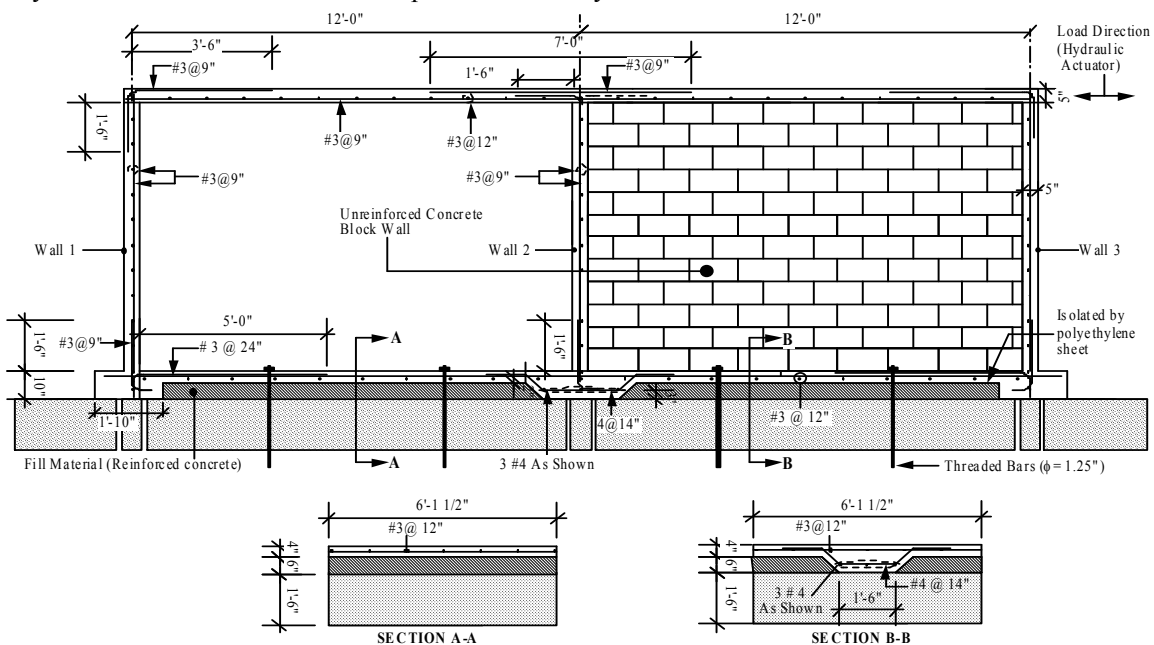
Details of dimensions, reinforcement and foundation for Specimen 2
